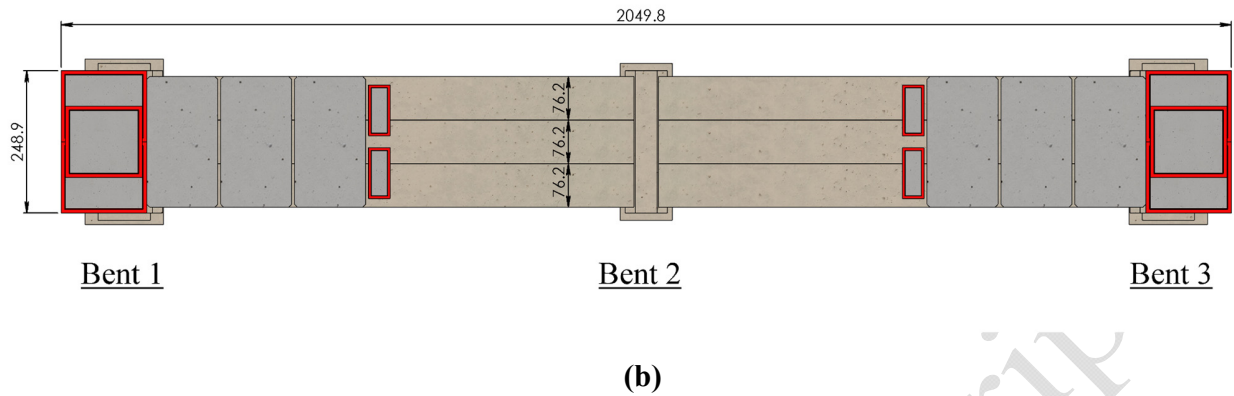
Geometry and configuration of two-span RC bridge tested in University of Nevada:
